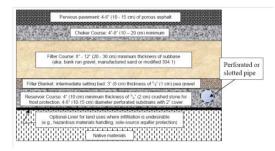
Typical Parking Area Cross Section for Porous Asphalt Courtesy: University of New Hampshire Stormwater Center
